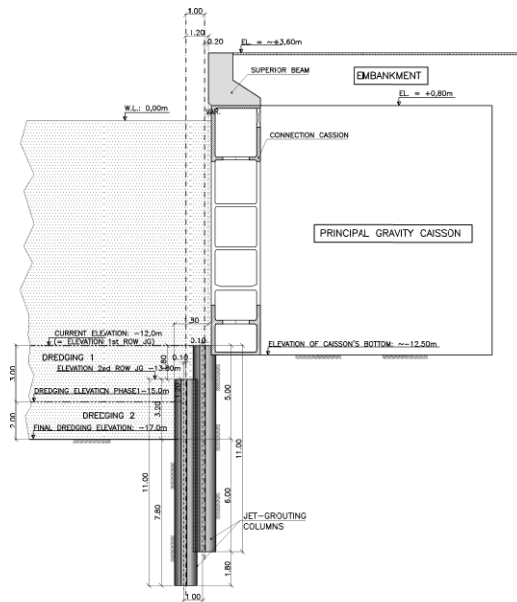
Execution of the jet-grouting columns in Caju Pier
